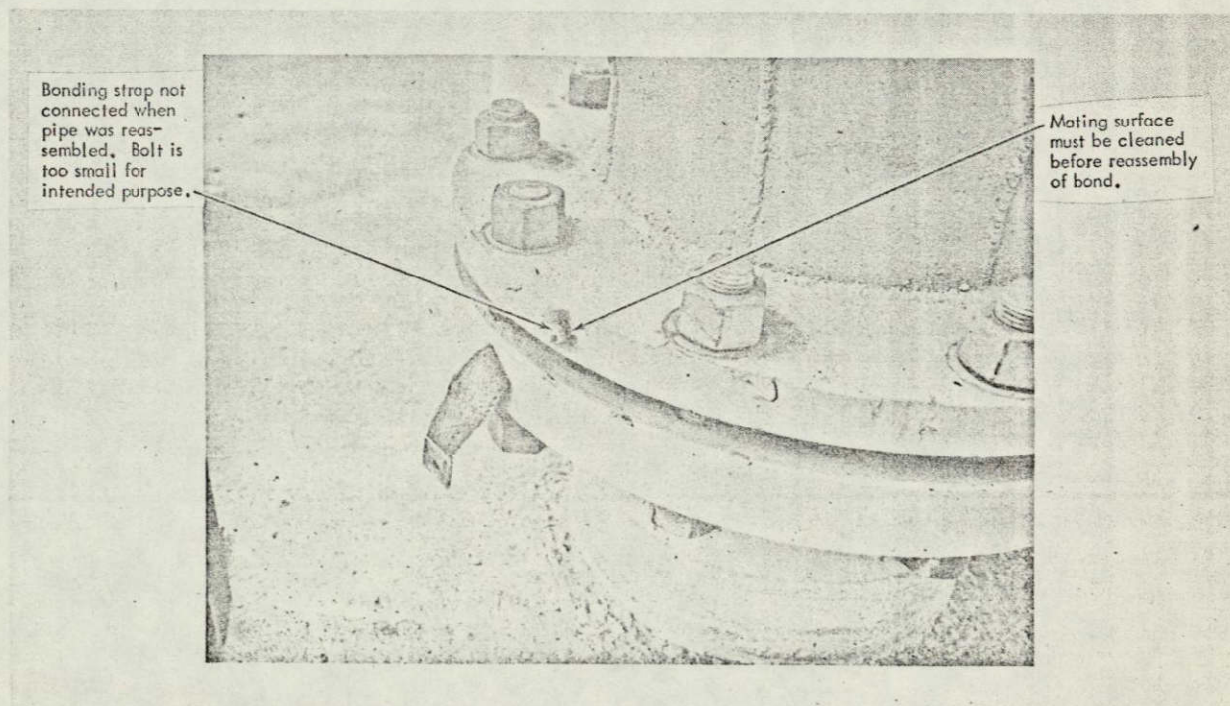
LC-39, Pad B - Disconnected Strap. Note inadequate size of screw for strap.
